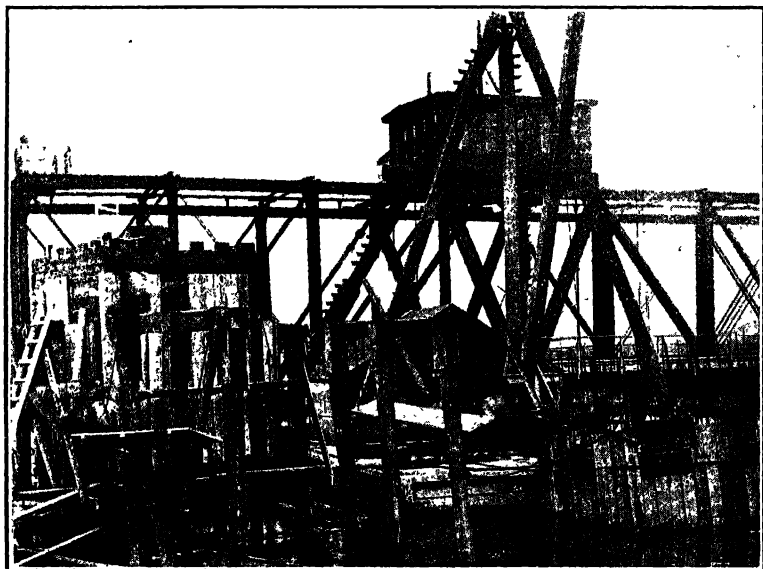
Sub-piers of the Jefferson Ave. Bridge, Detroit, Michigan.
